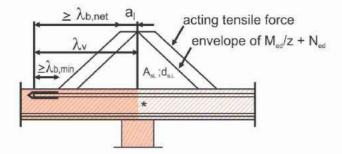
Overlap joint in foundation of a column or wall where the rebars are stressed in tension.
